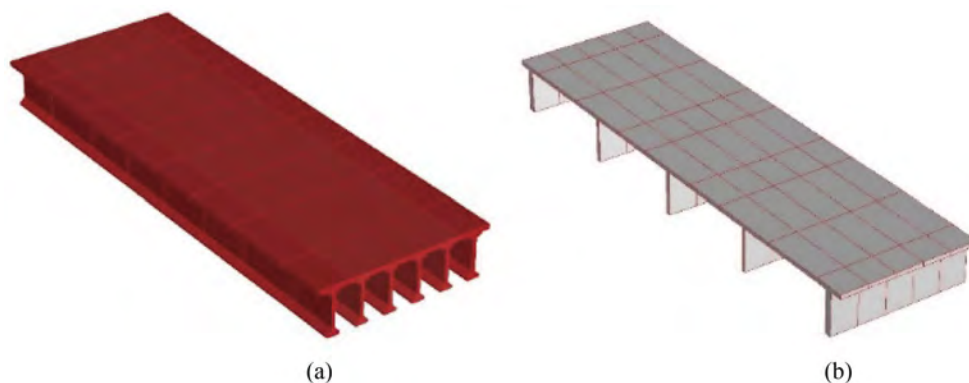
Isometric view of a beam model of the bridge deck: (a) longitudinal beams and (b) transversal beams with collaborating top slab.
